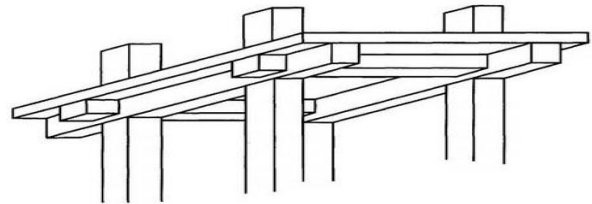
Two-way slabs with beams(www.dailycivil.com)
